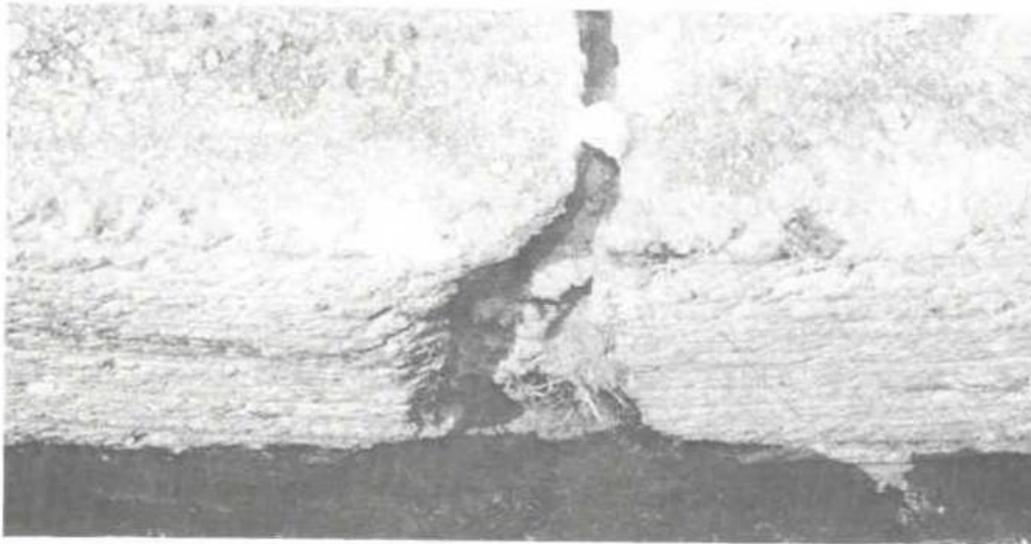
Photograph of vertical profile of crack. Inverted trough shaped deterioration is in the center of the bottom half of the photograph. The transverse crack at the pavement surface shows in upper center of photograph (Ramamurti and Jayaprakash 1987).
